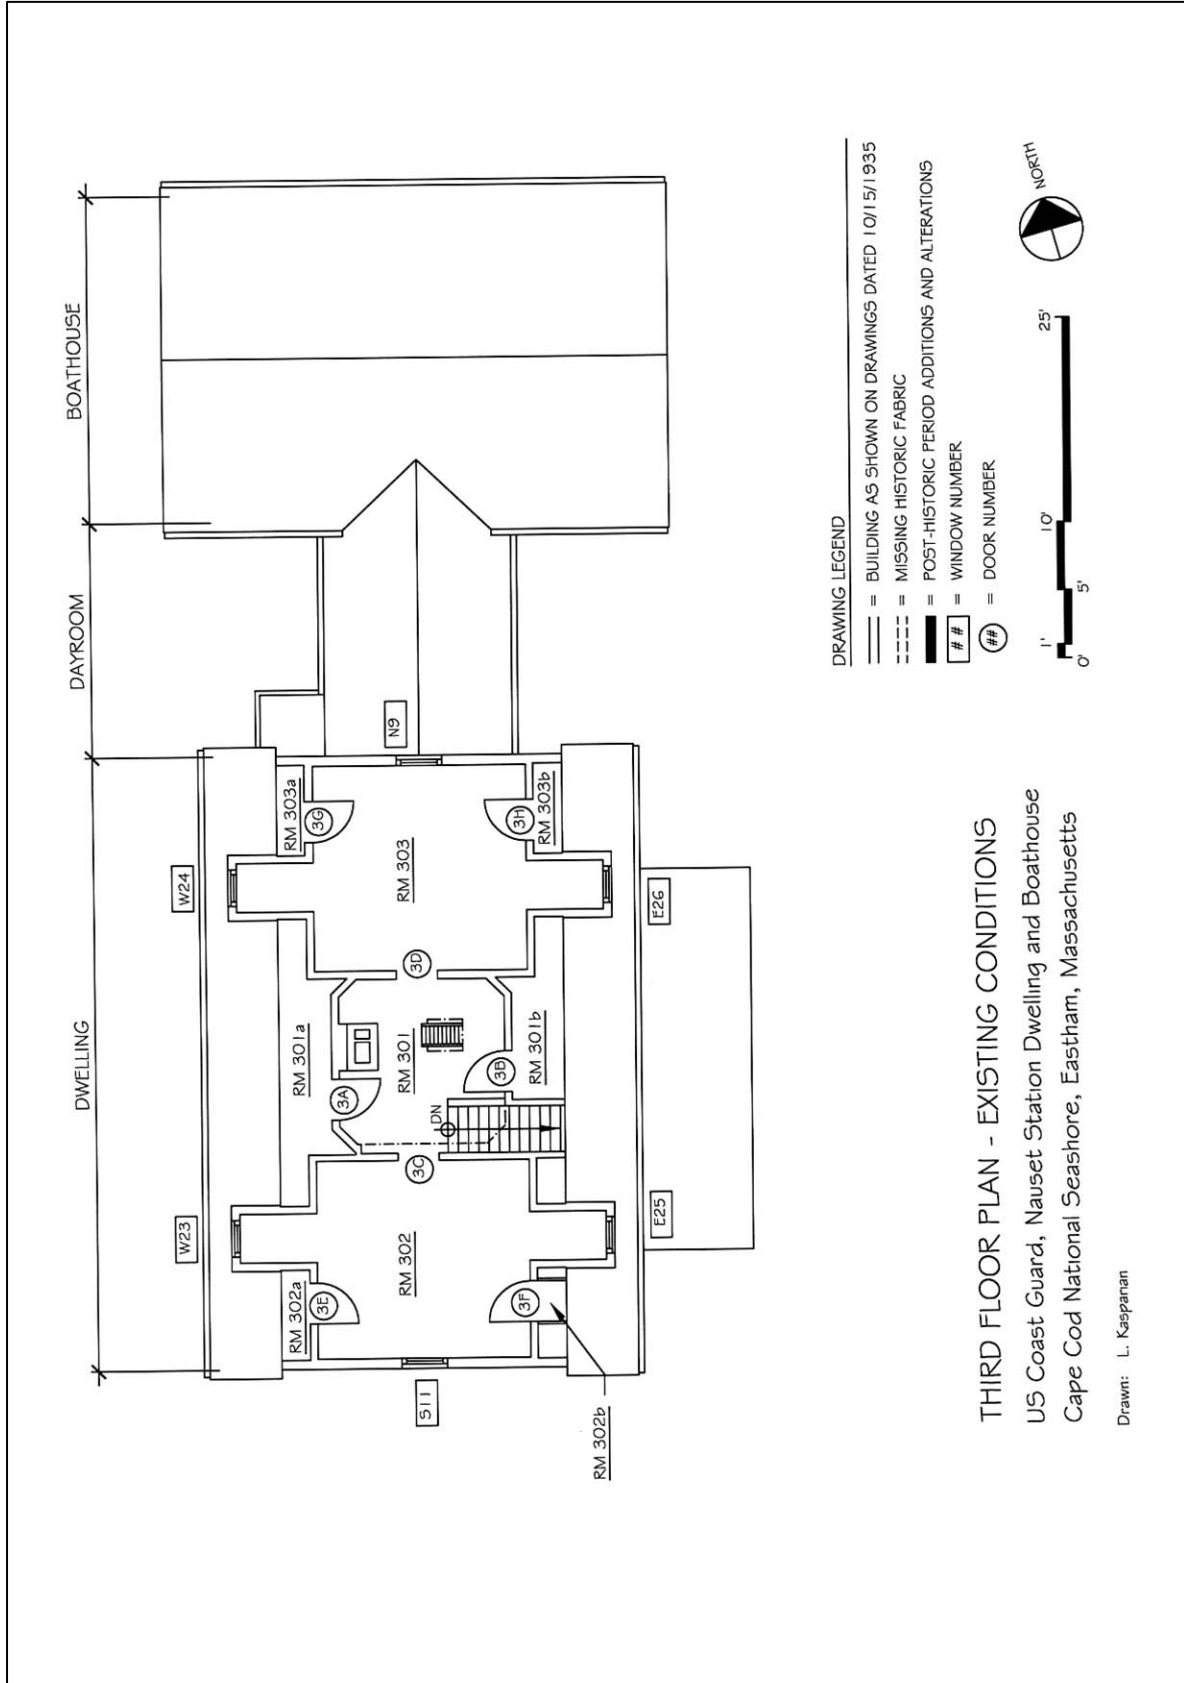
Third (Loft) Floor Plan – Existing Conditions.
